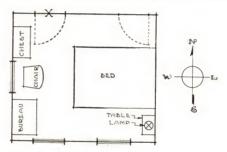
Typical Layout for 10'x12' Bedroom with Double Bed
